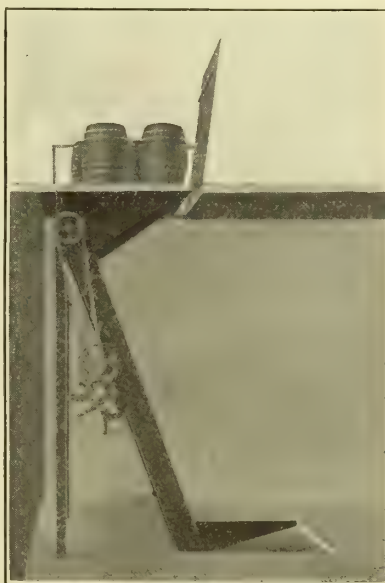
Platform level with sidewalk. Shown with sloping pit
